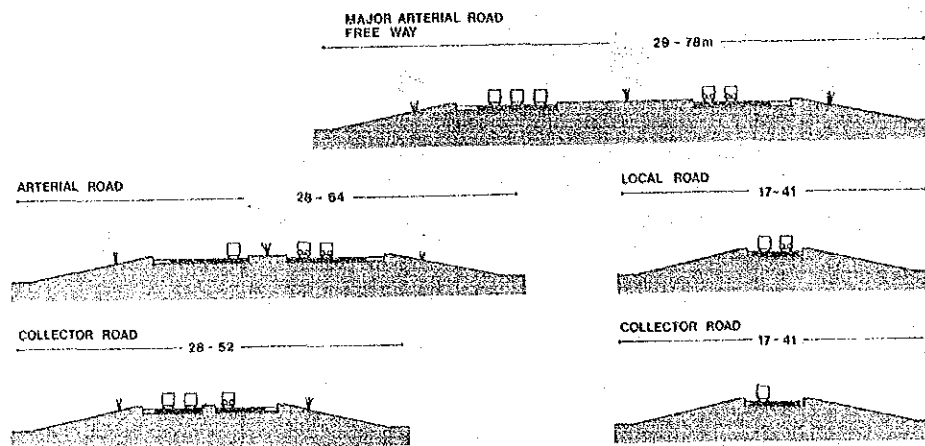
TYPICAL CROSS SECTION OF PRIMARY SYSTEM
